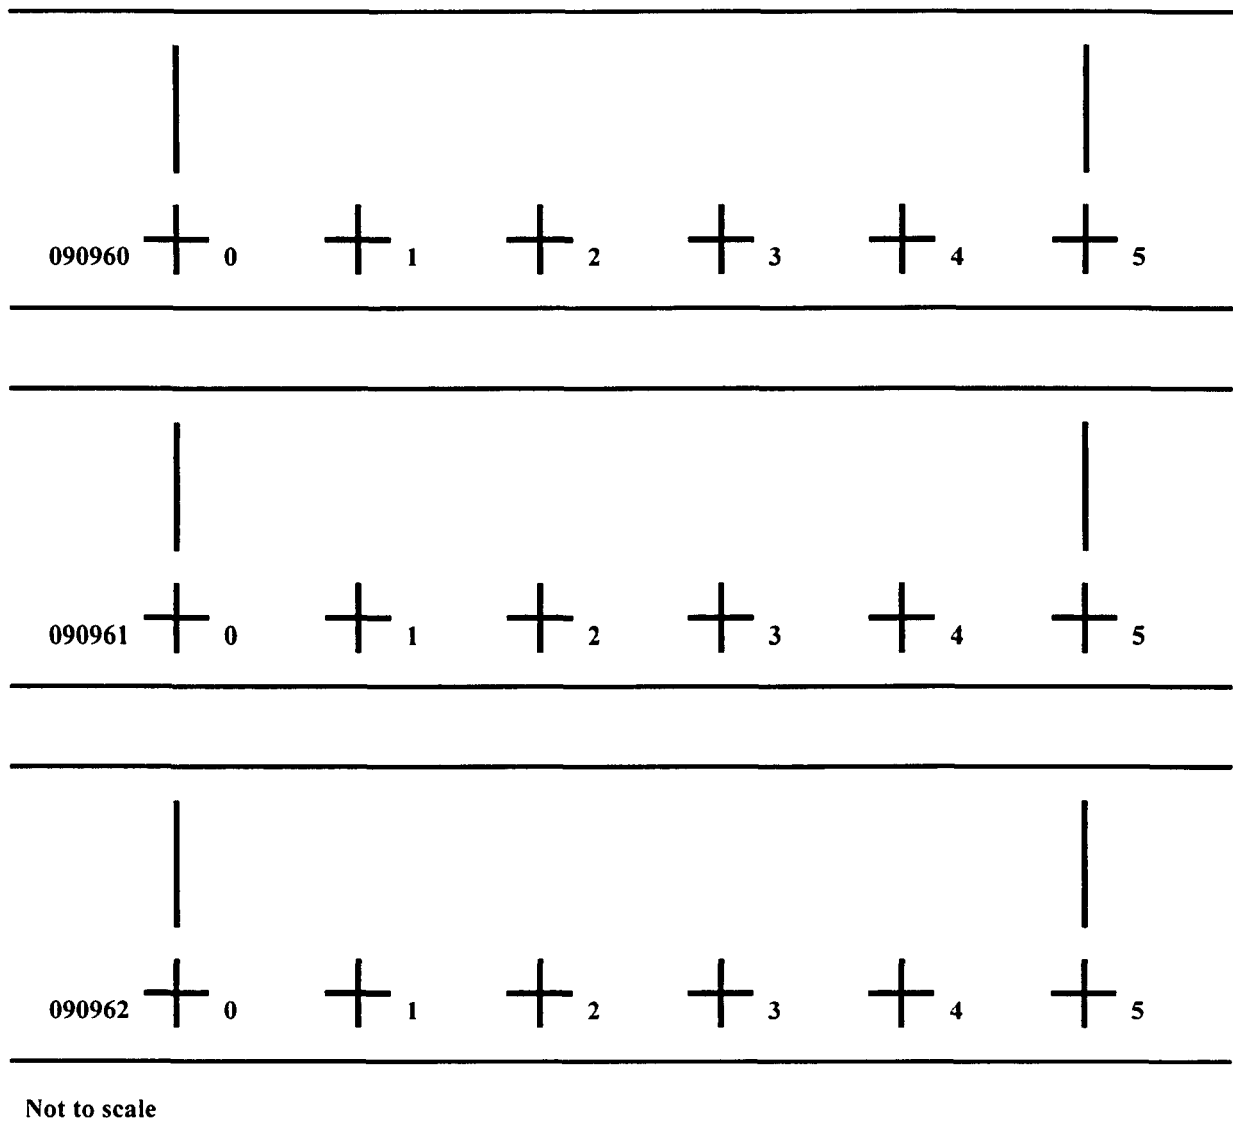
Route 2 West Bound SPS-9A RAP Test Sections Site Marking Plan After Construction
